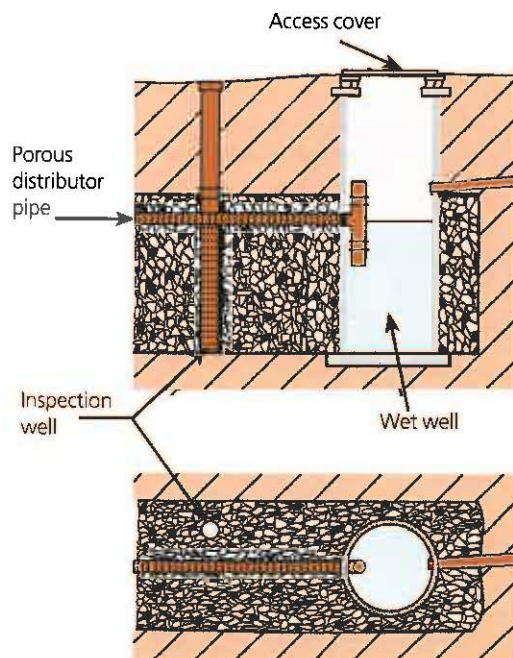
Cross-section of a trench-type soakaway with a large wet well, equipped with a T-piece overflow to the porous distributor pipe and separate inspection well
